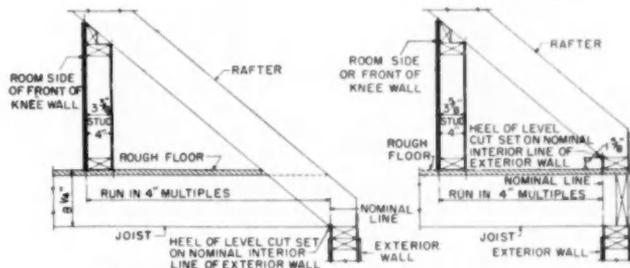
Section through knee wall in dropped plate condition (left) and with raised plate. Knee wall height (H) is the combined height of knee wall section plus inside face of the beveled purlin above it
